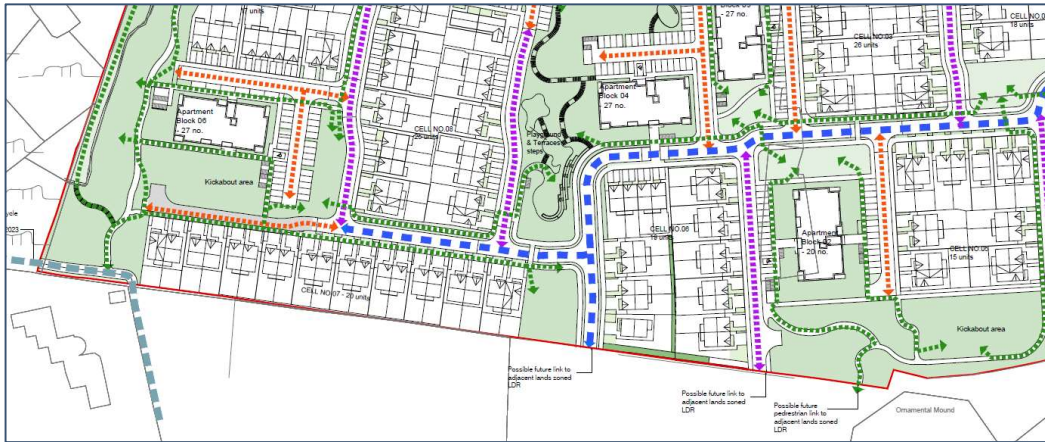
Connections to Zoned Lands to the South (extract from drawing 18128-3020)
